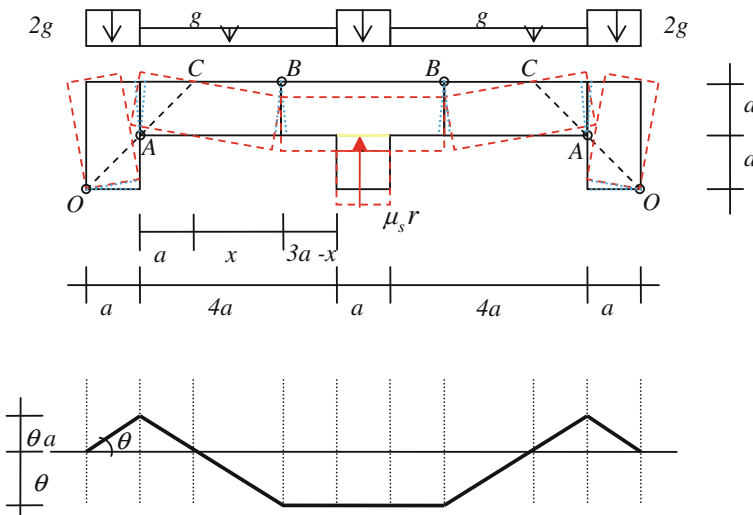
A masonry bridge whose central pier has settled vertically
